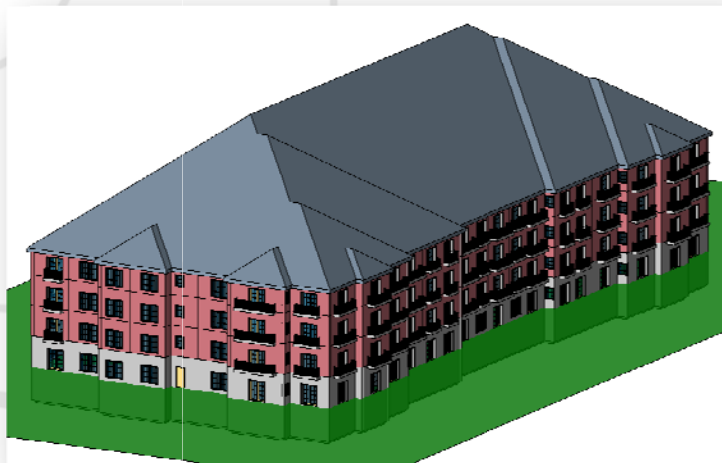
B: Thin Brick Precast Panel Façade Render Utilizing Autodesk Revit®
